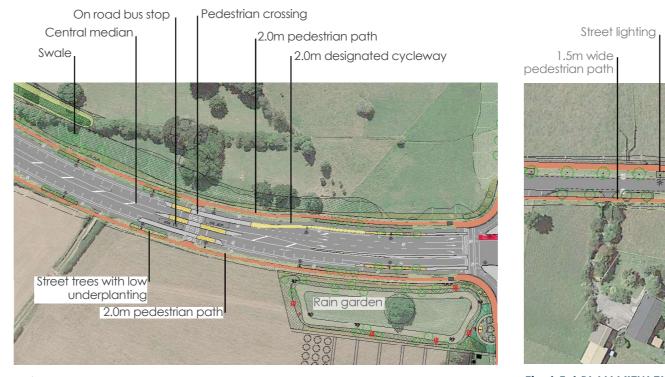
PLAN VIEW EXTRACT OF PEACOCKES ROAD
